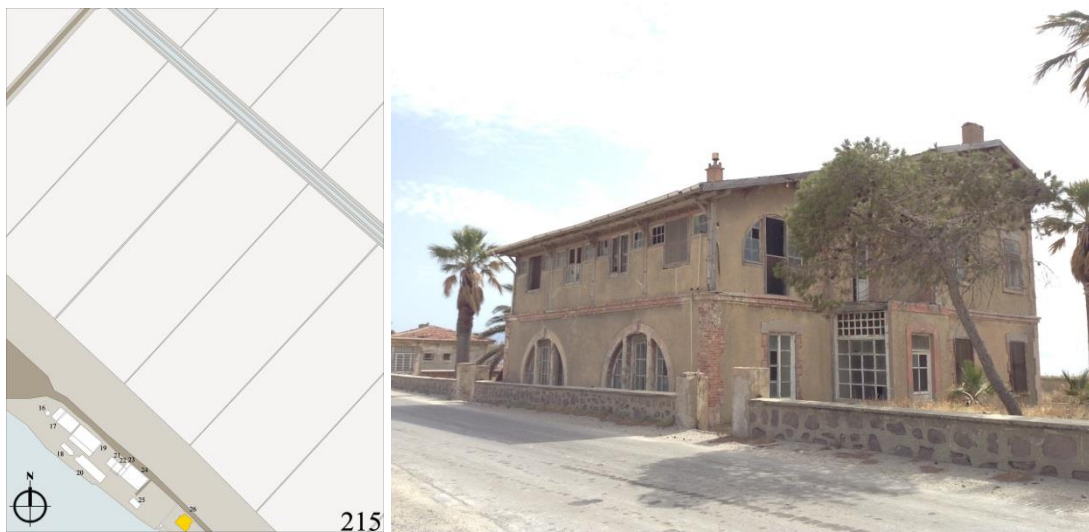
Site plan and view from the northern corner of the Pink Mansion (Author, April 2016)
